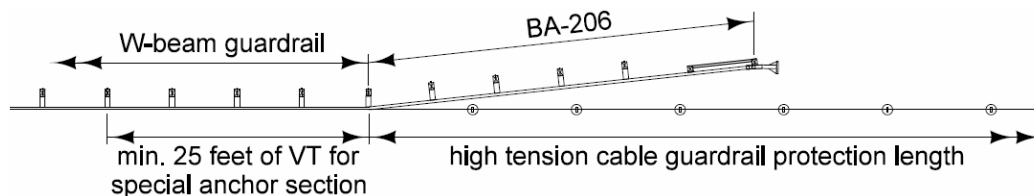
High Tension Cable Guardrail to Steel Beam Guardrail connection.
